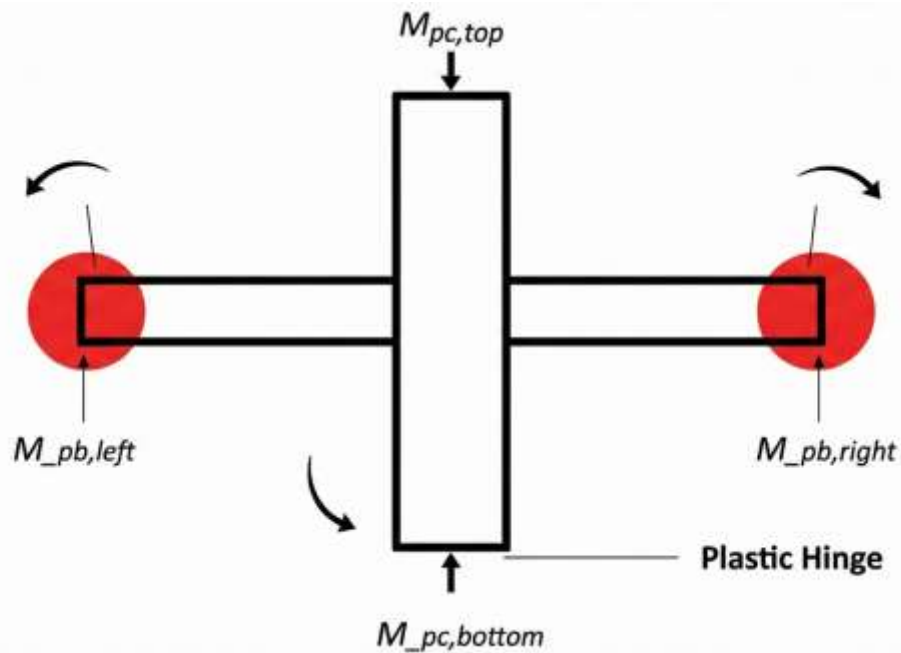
Strong Column-Weak Beam Principle Diagram in Beam-Column Connections
